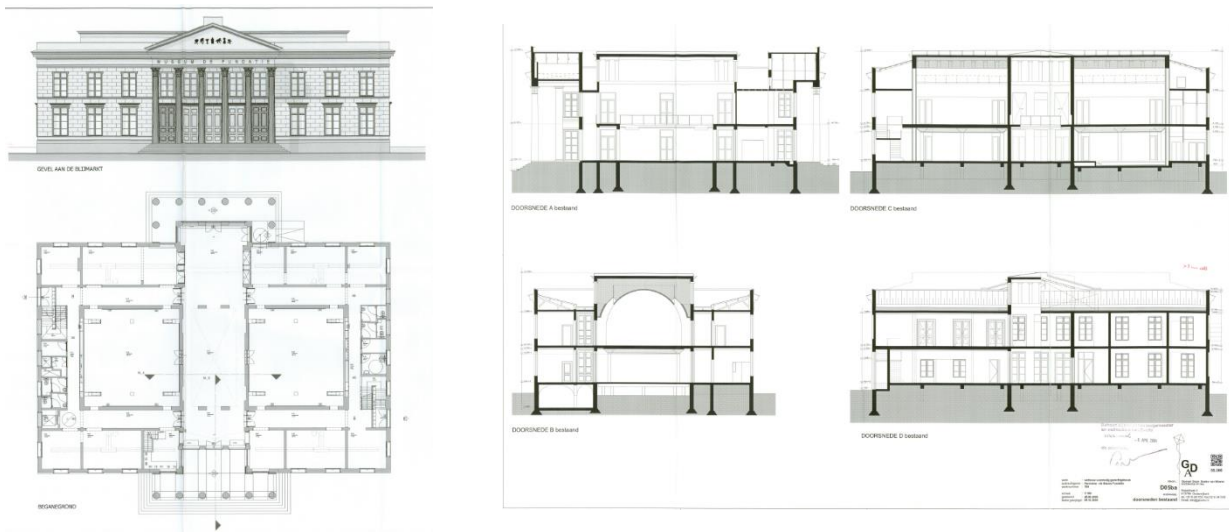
left: The ground floor plans and the Façade at the Blijmarkt.
